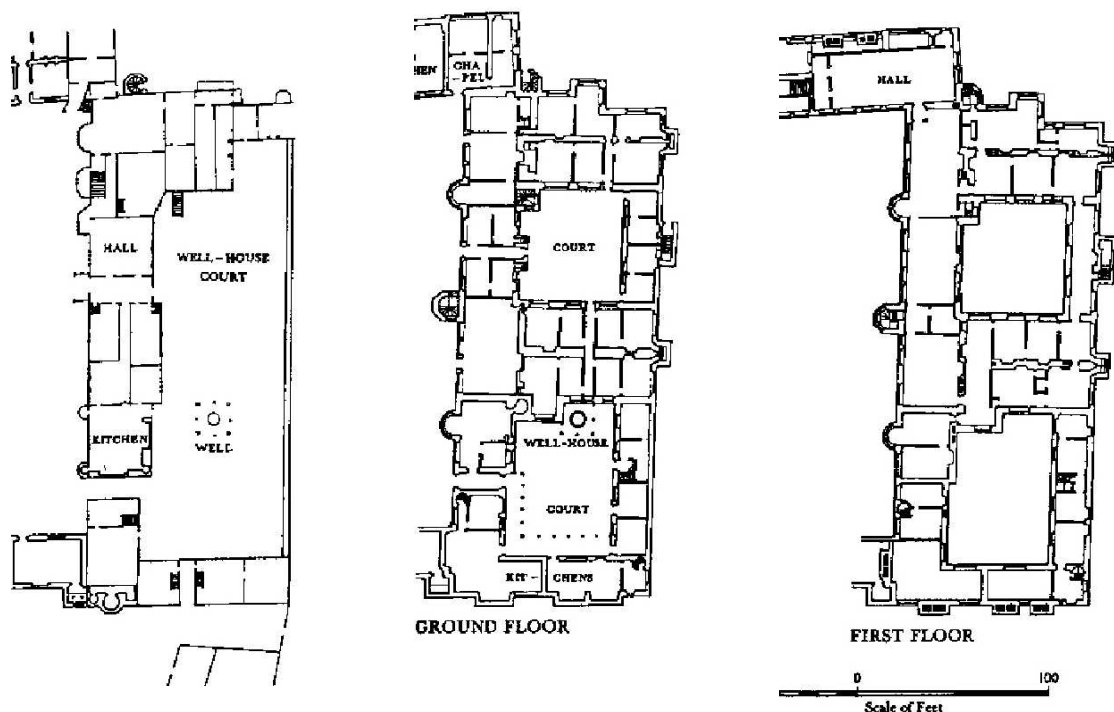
The original plan of the wellhouse court wing and the proposed rebuilding of that area showing the ground floor and first floor. Note the position of the well is respected in the proposals.
